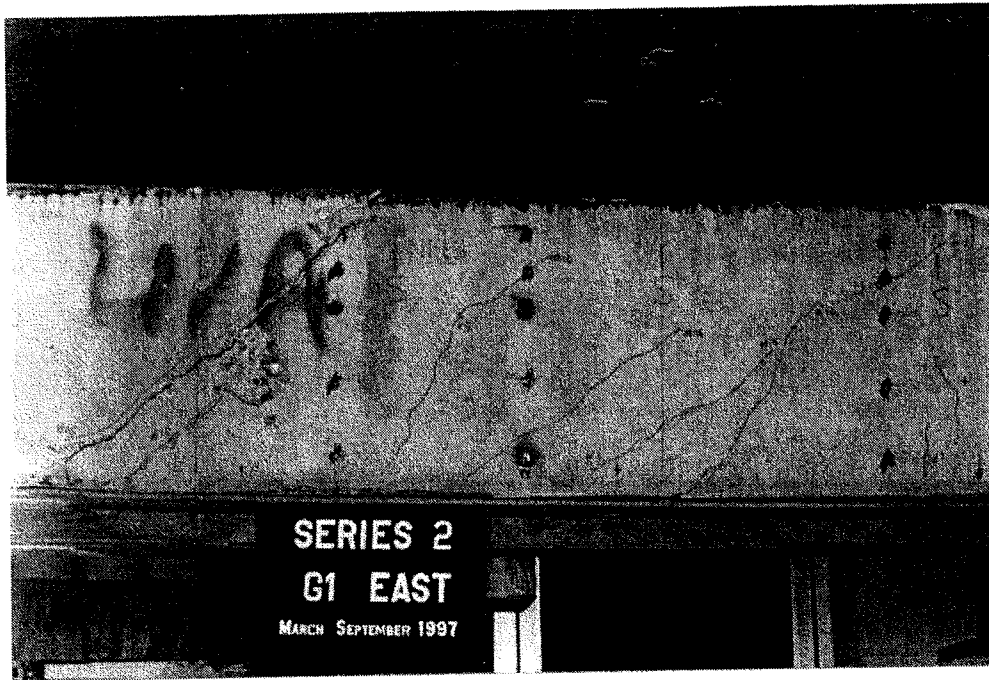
Concrete Cracks on the Exterior Face of the Loaded Leg without FRP Shear Strengthening (*Girder 1 East*)
